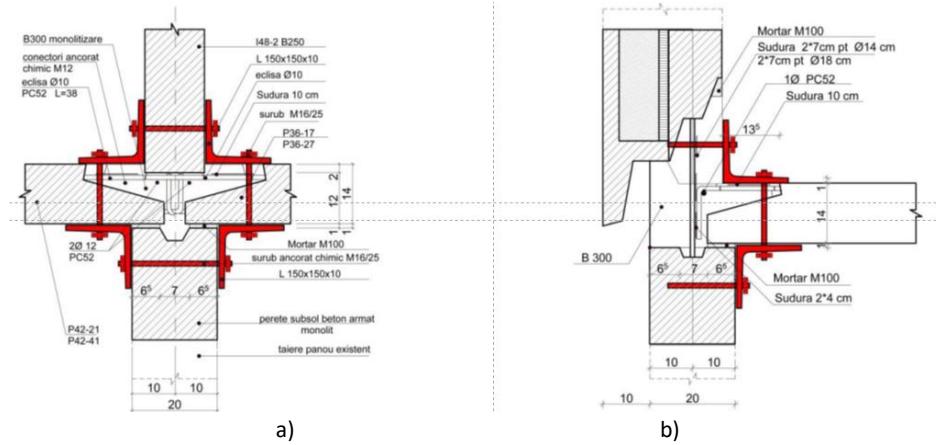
Strengthening solutions applied to reinforce vertical (a) and horizontal (b) joints between panels.
